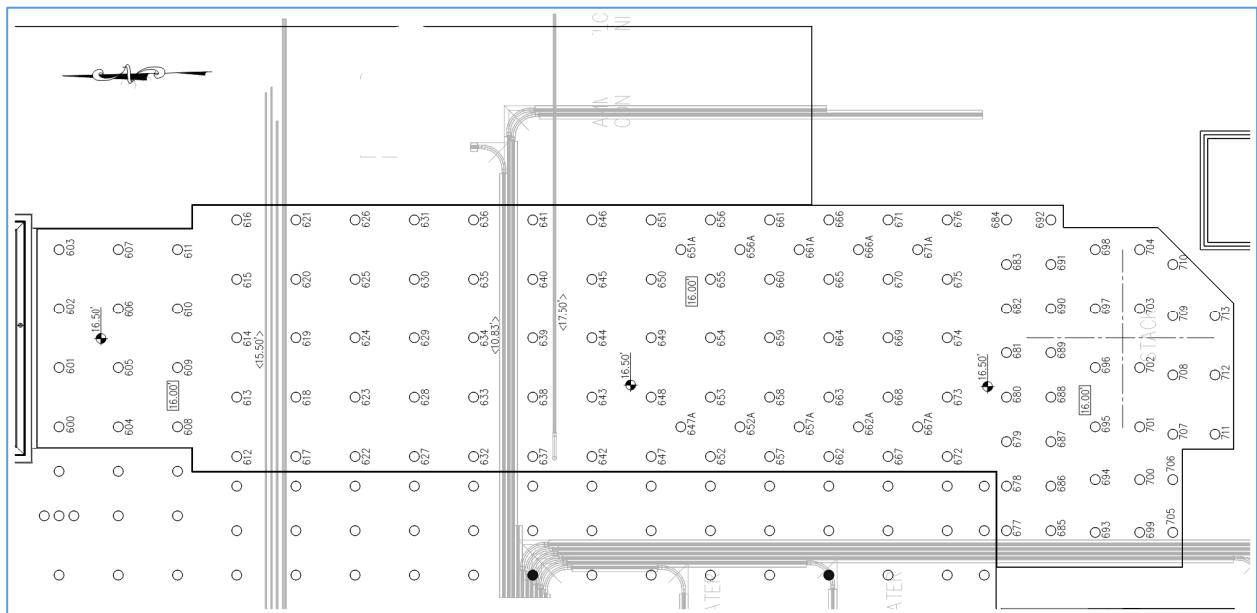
Example Mat for One Structure for New Energy Facility – Woodbridge NJ
